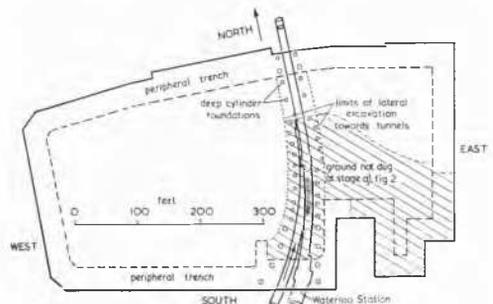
Plan of site; the whole area was excavated to a depth of about 40 feet.
